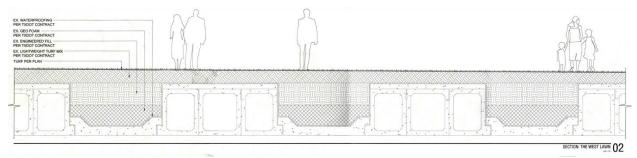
Section drawing of Klyde Warren Park's deck structure. Courtesy of Michael Gaffney. Edited by the author.
